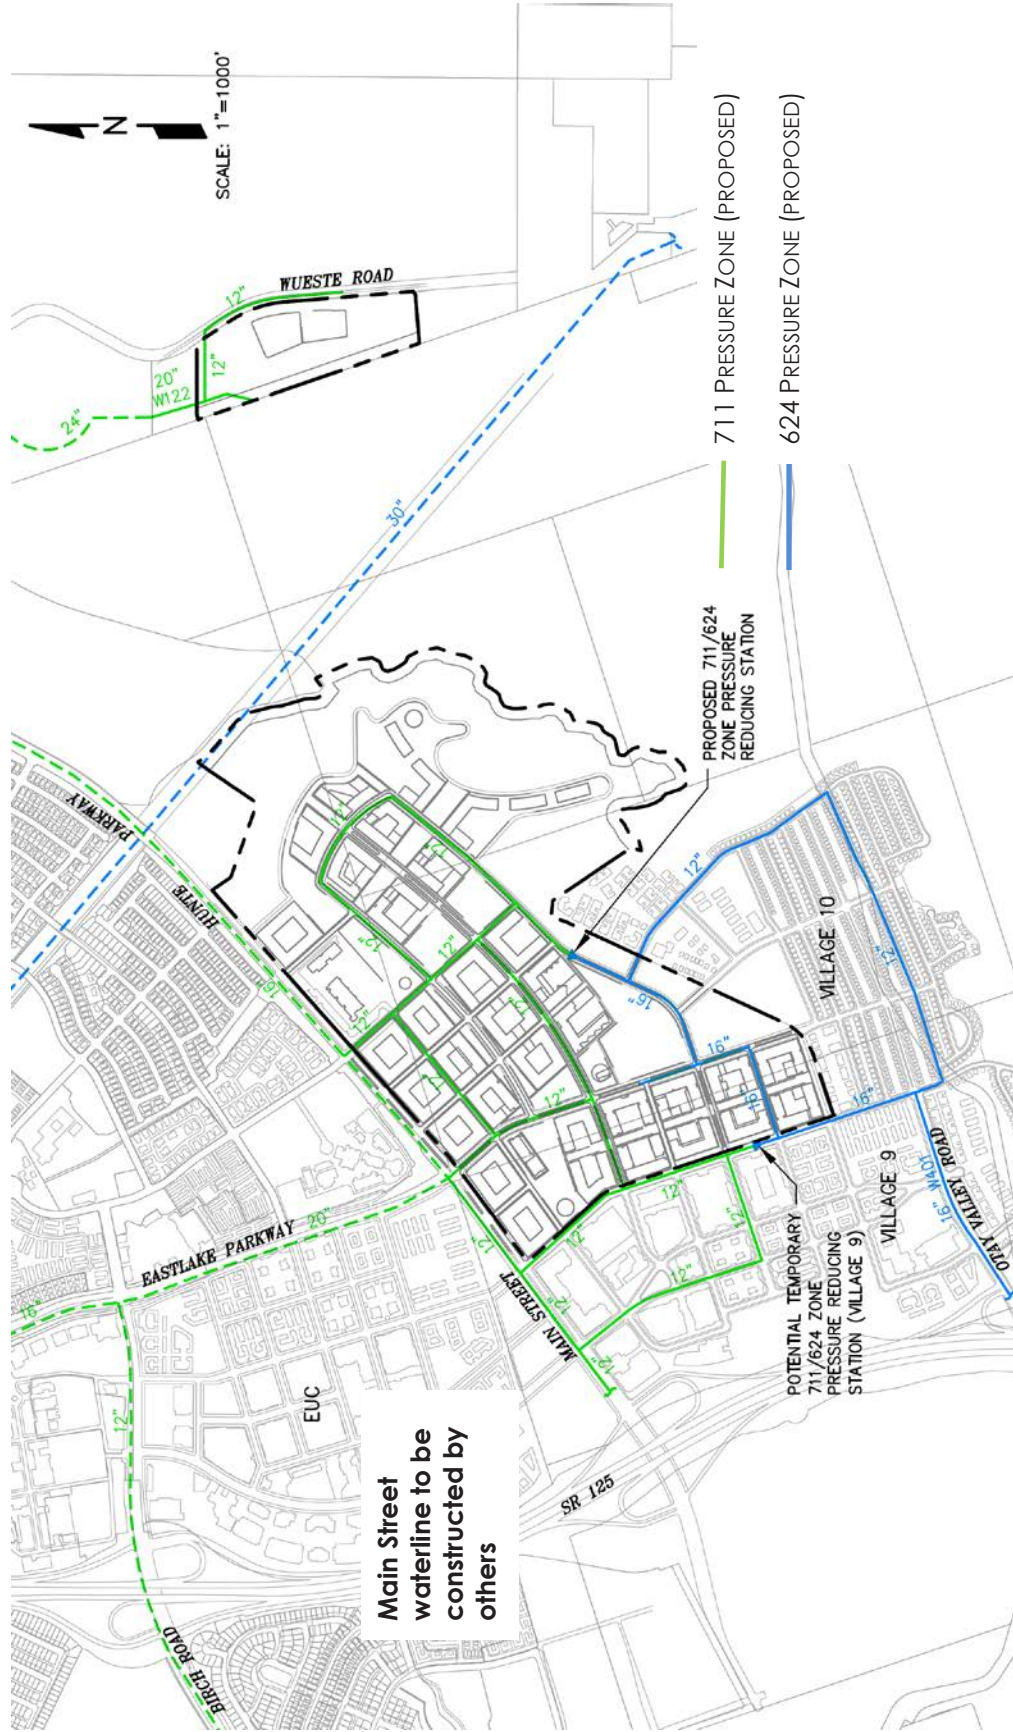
ON-SITE POTABLE WATER FACILITIES
